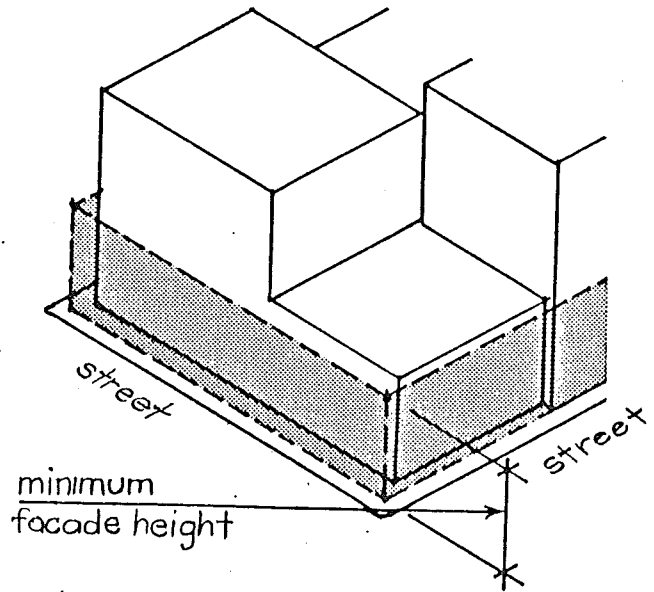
A MINIMUM FACADE HEIGHT
